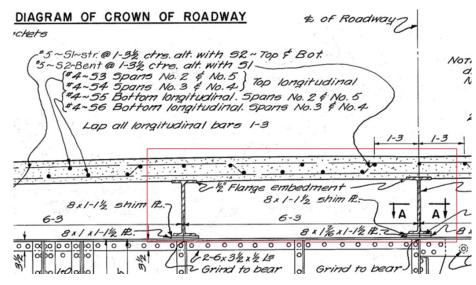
Section from Fred Robinson Bridge drawings. The red box shows the approximate location of the test slabs' representation of the bridge deck and the girder supports shown later in Figure 37.
